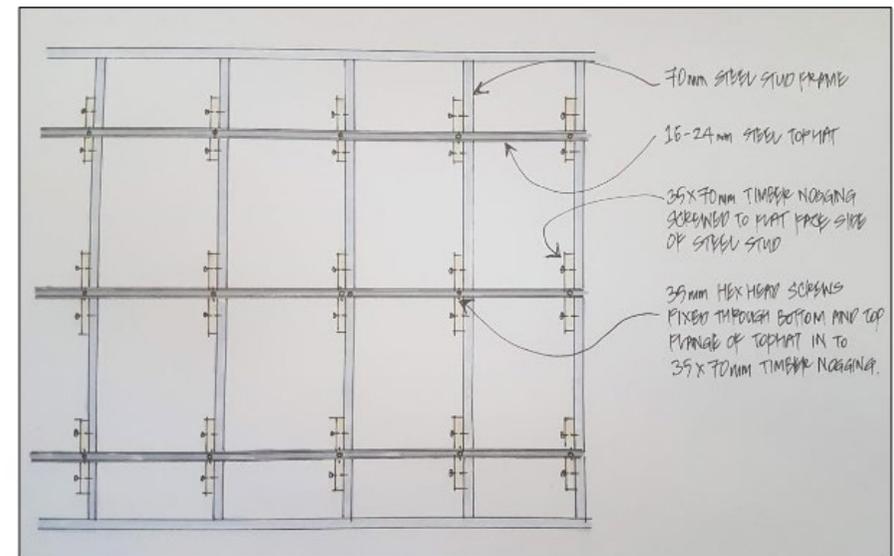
Proposed construction detail for the overhanging Hebel Intertency system affixed to a steel frame using timber noggins and top hats
